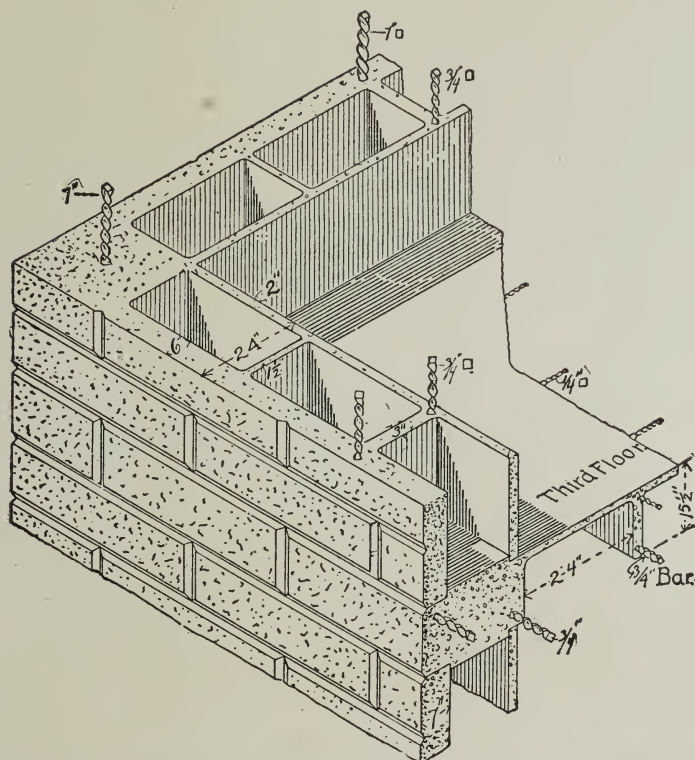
Wall and Floor Construction, Alabama Apartment-house, Buffalo, N. Y.
